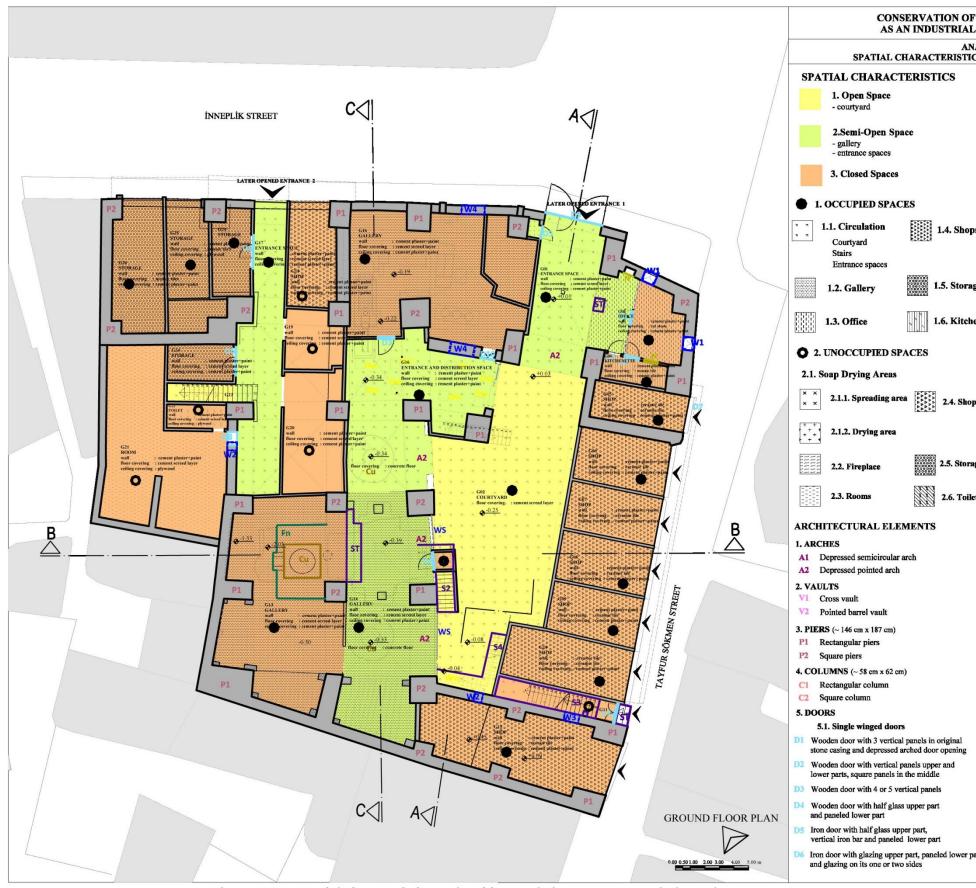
Spatial characteristics and architectural elements – Ground Floor Plan
